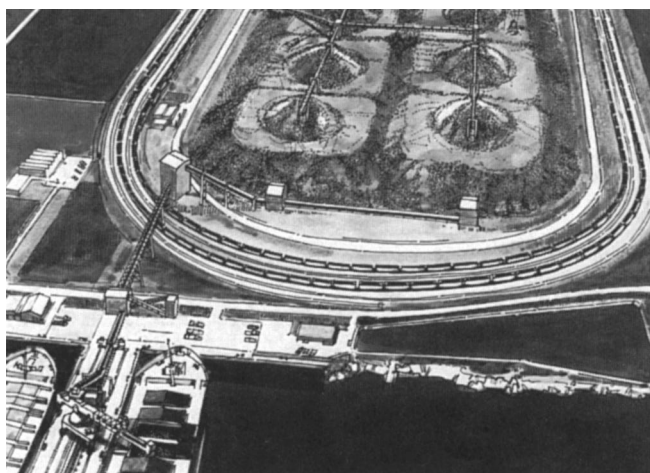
Open storage piles using gravity drawn down to feed underground conveyor belts (courtesy: McNally-Wellman).
